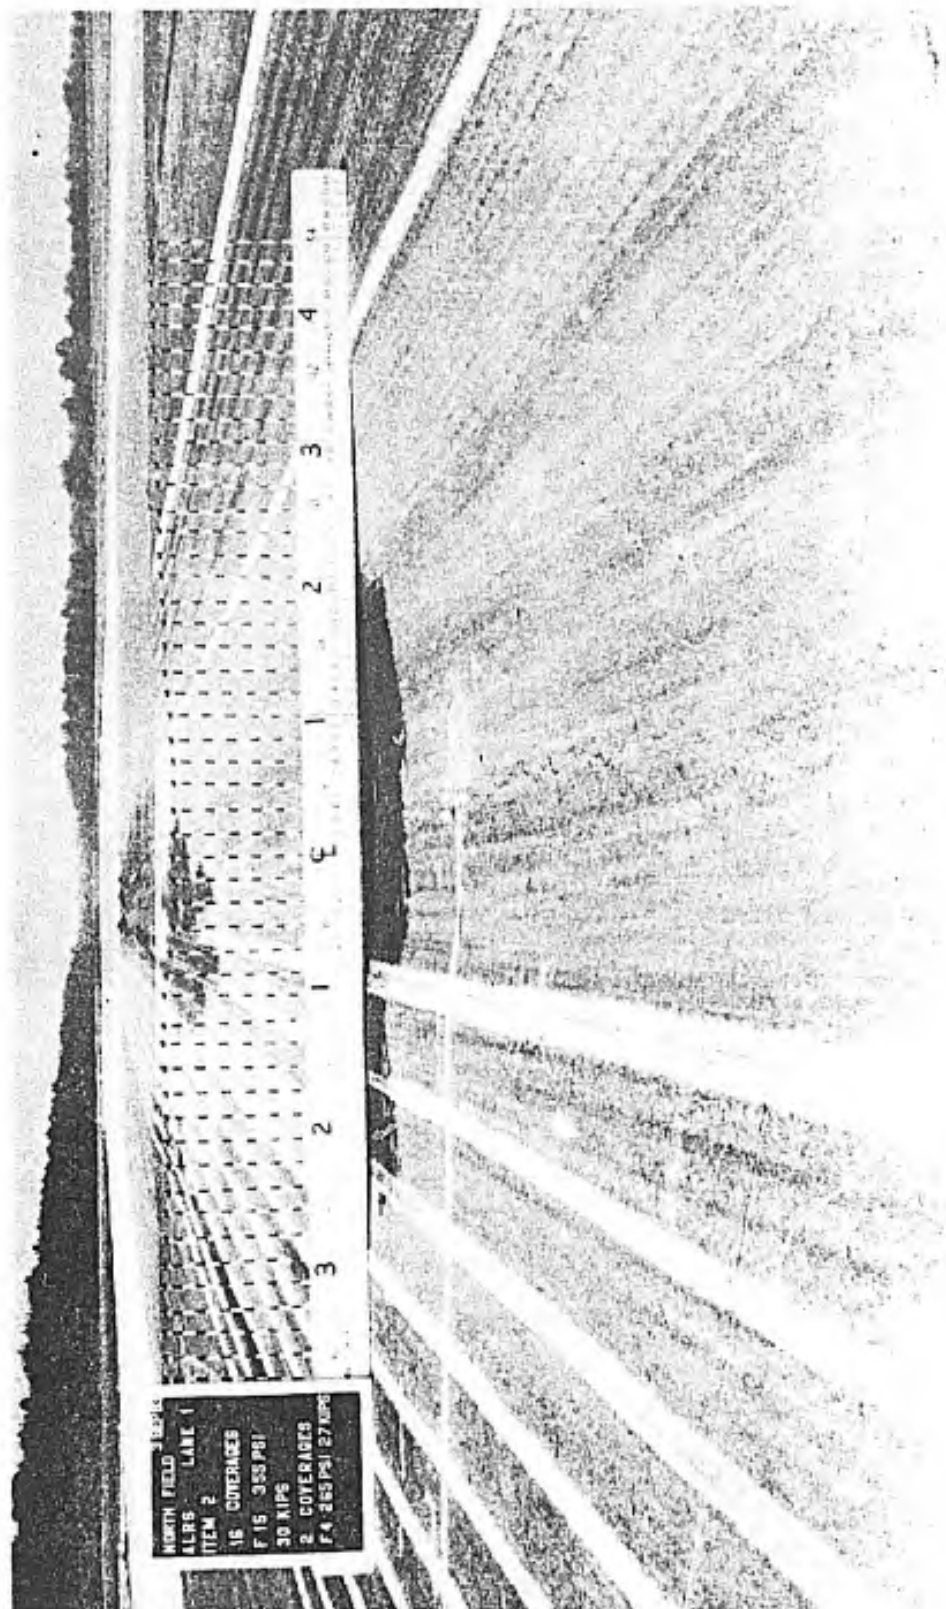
Surface construction of the F-15 Traffic Lane after 16 Coverages.
